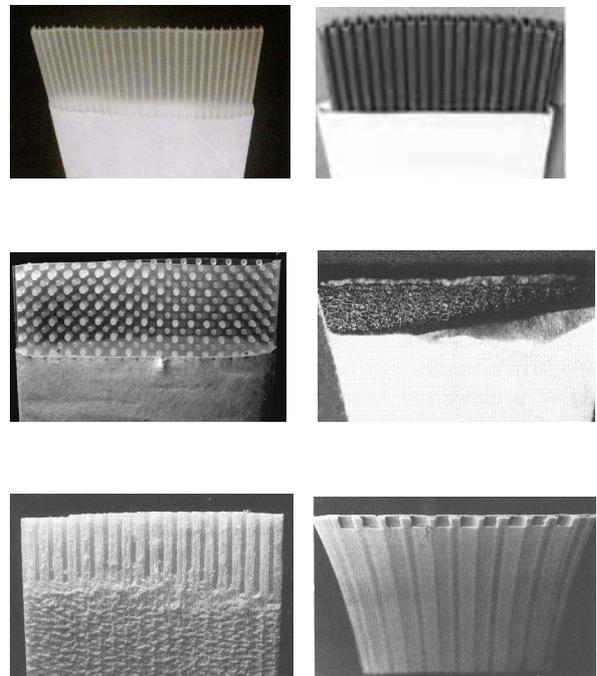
Examples of different makes of band drains (From top, left to right: Geodrain, Mebradrain, Alidrain, Colbond, Castle board and PVC).
